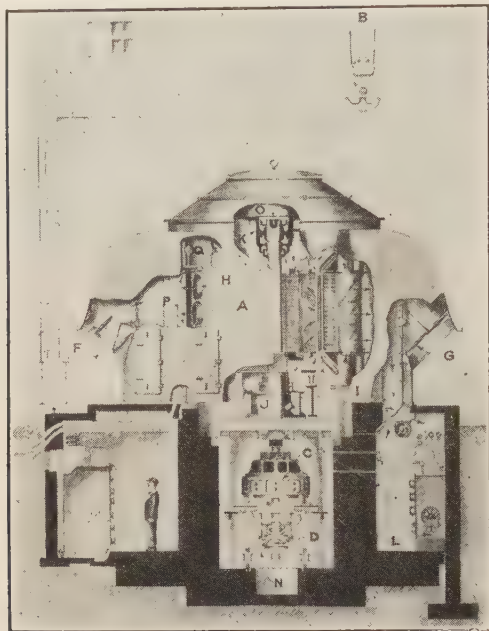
GENERAL ARRANGEMENT OF UNIT ON FOUNDATIONS
